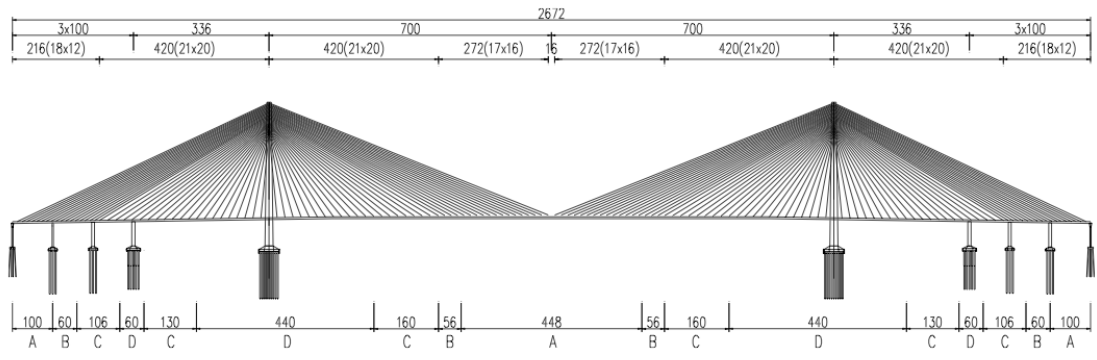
The model of a super long span cable-stayed bridge developed by Xiong et al. (2011).
